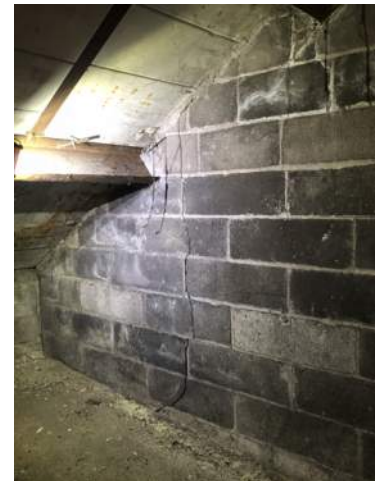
Interior Attic North Wall West side vertical crack
